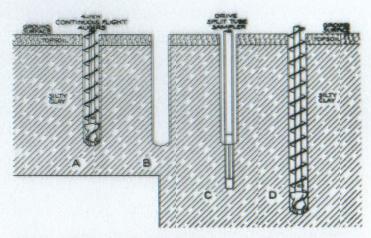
Continuous flight auger drilling. A. Advance auger to sampling inerval;
